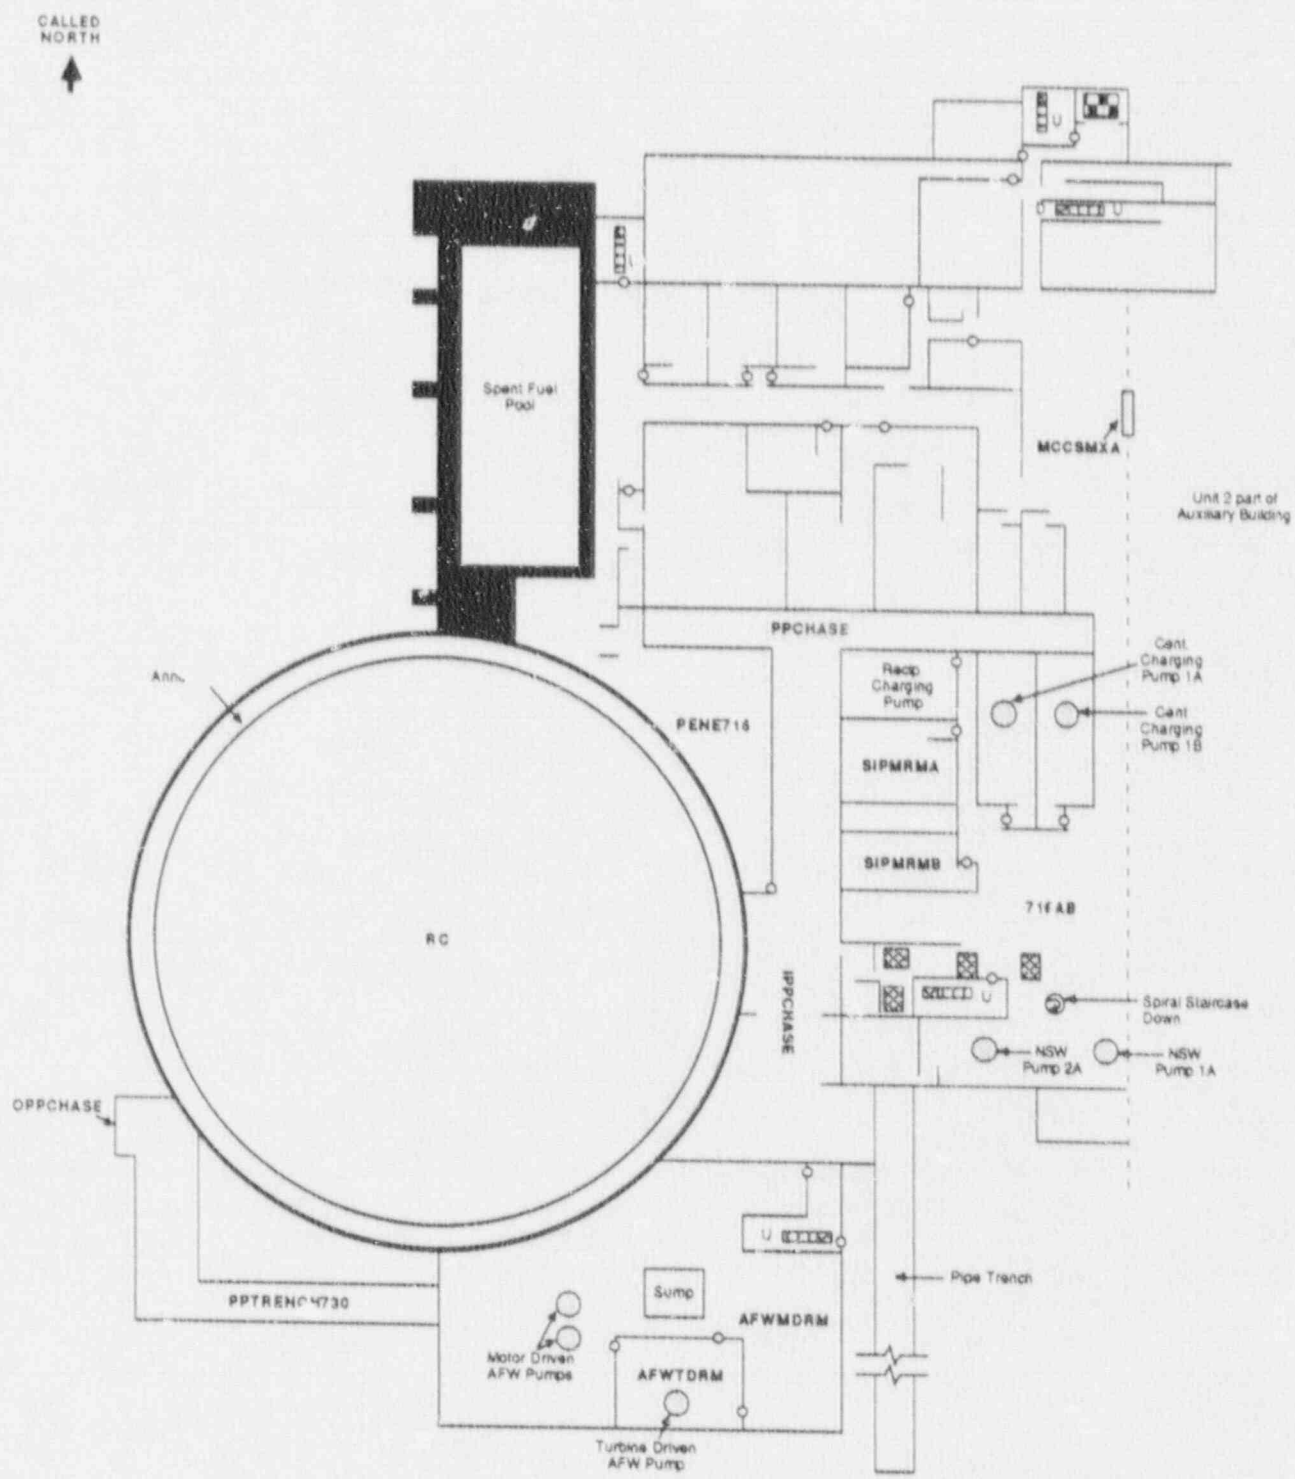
McGuire Unit 1 Reactor and Auxiliary Buildings, Elevation 716'
